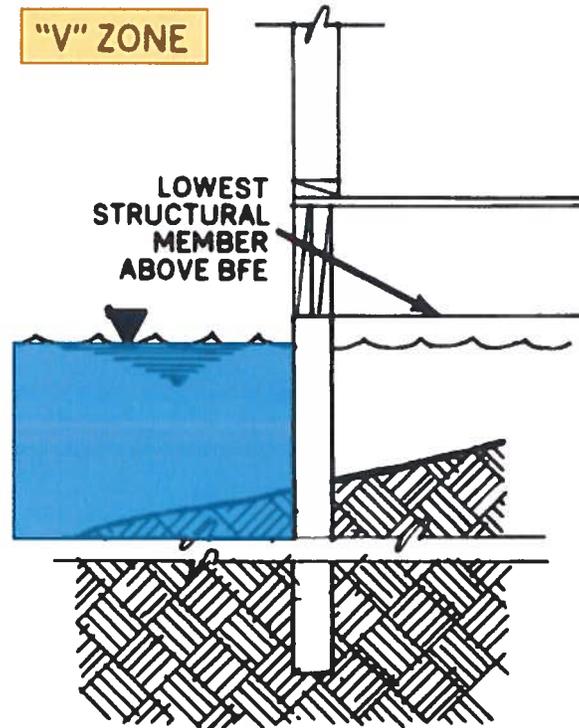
Required Construction Above Base Flood Elevation in a V-Zone
